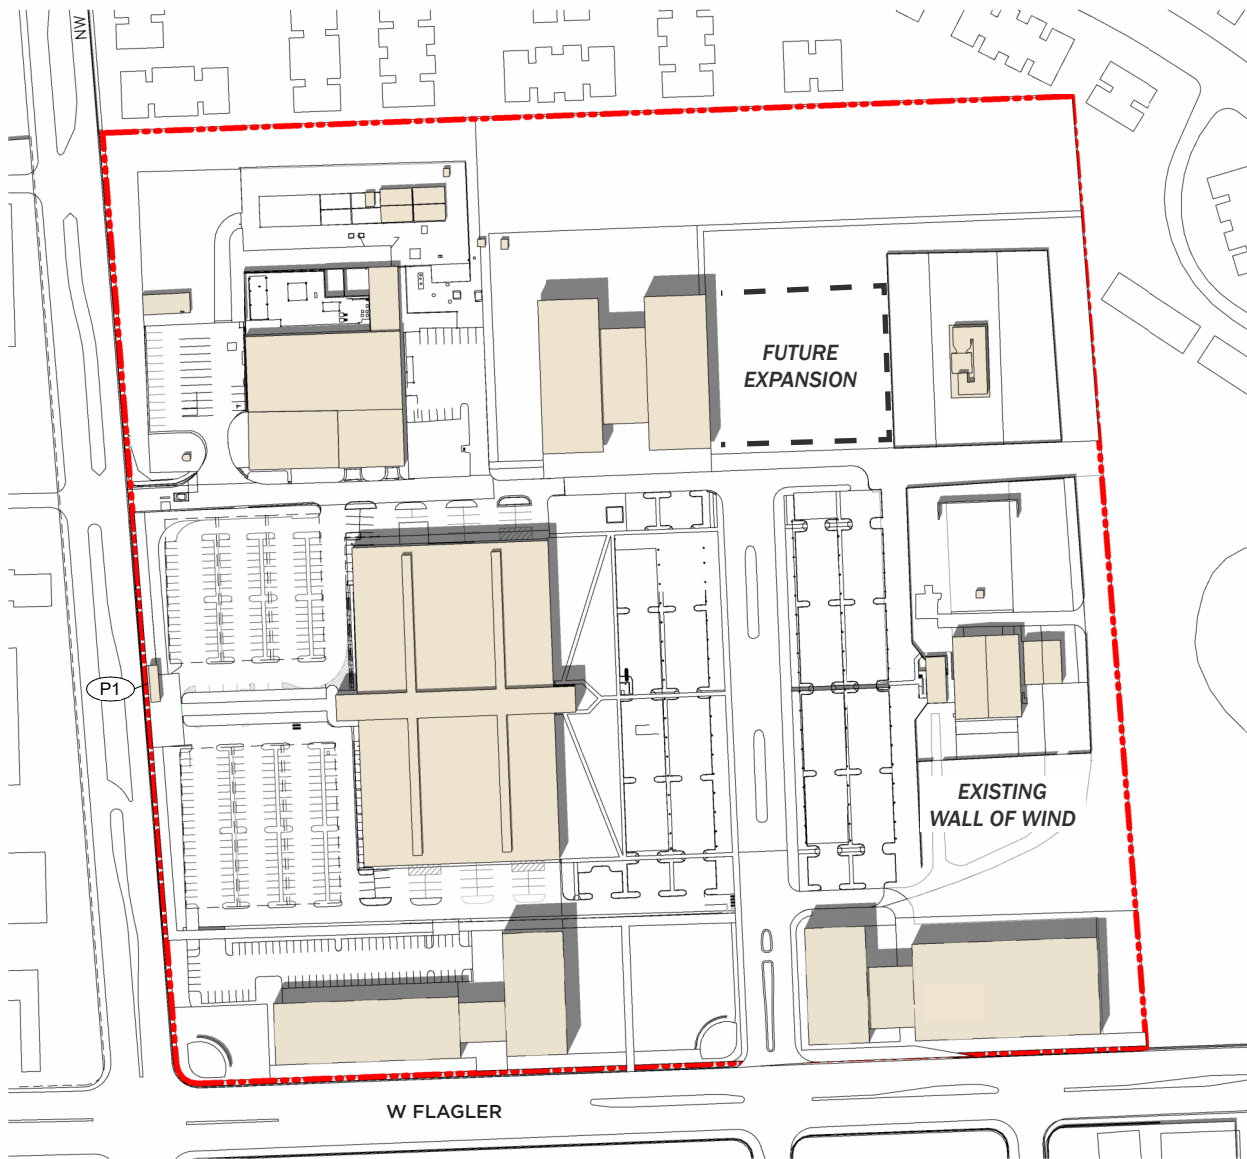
MMC 2035 PLAN - HOUSING FACILITIES
